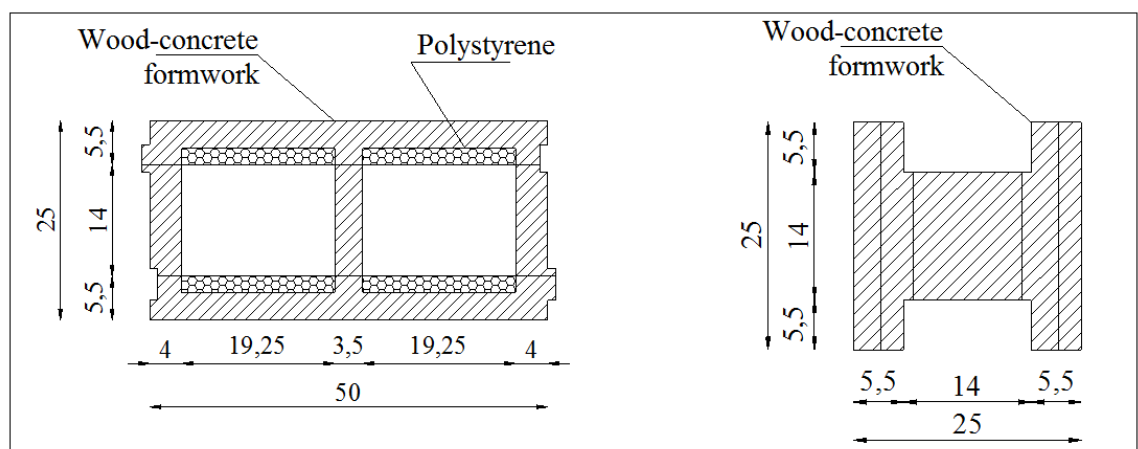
Scheme of formwork block of 25/18 used in the Lab.Tests
